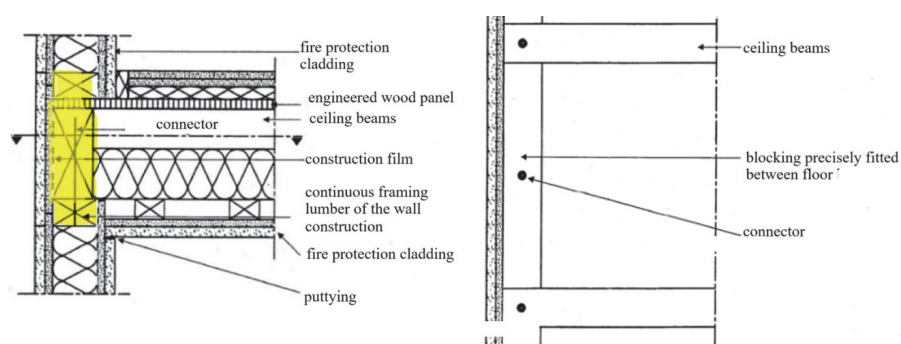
Connection of ceiling to load-bearing and room-enclosing wall with fire protection cladding – e.g. stairwell or exterior wall, with the ceiling joists oriented perpendicular to the wall (left: vertical section, right: horizontal section)
